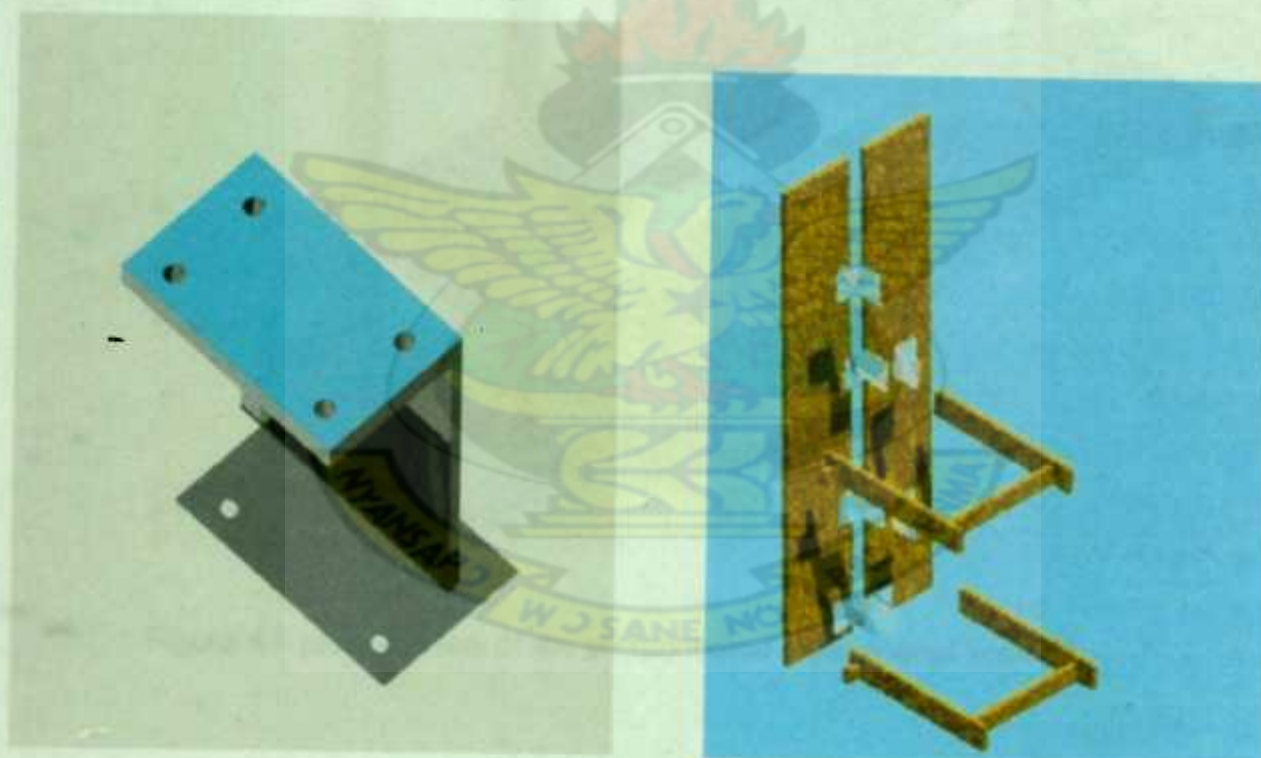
Angle plate for joining boards. Figure 4.4 view of formwork parts
